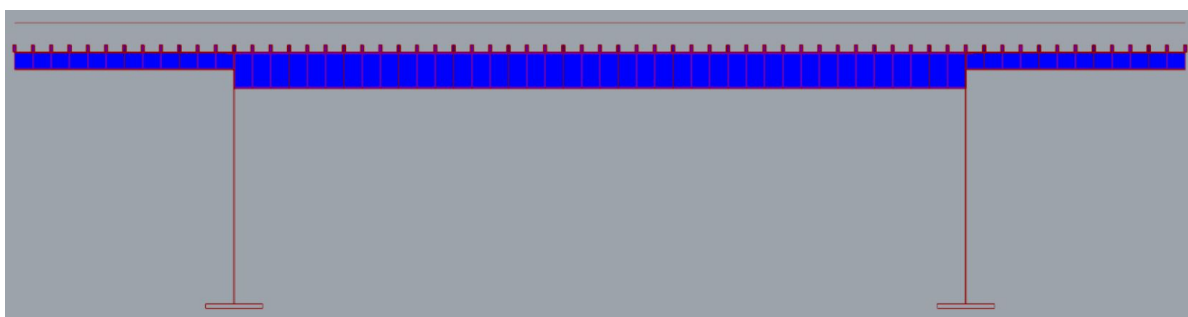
Cross-section of the double-girder bridge as modelled with Karamba in Grasshopper
